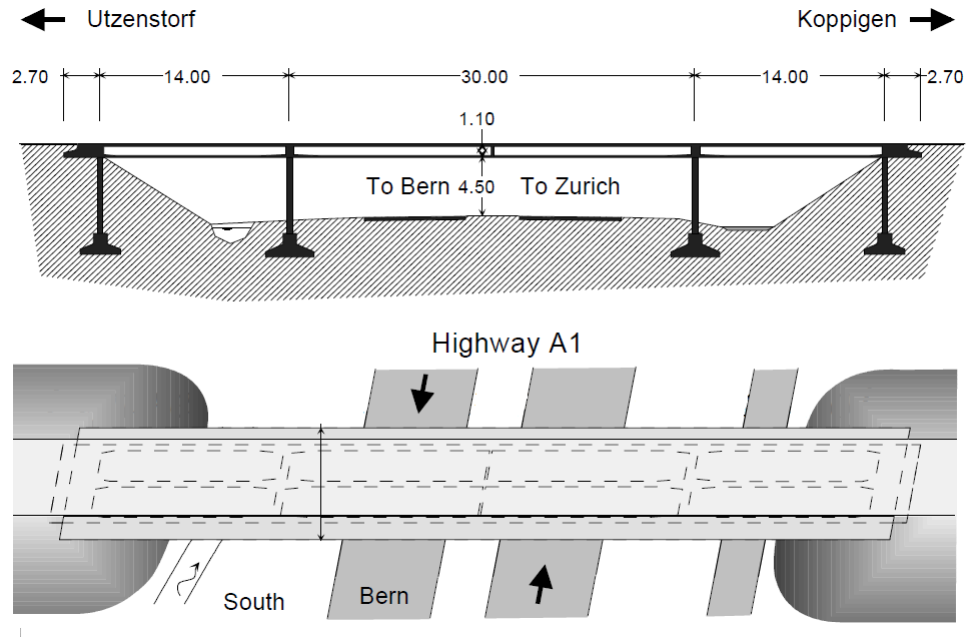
Elevation Plan and Overview of Z24 Overbridge [4].
